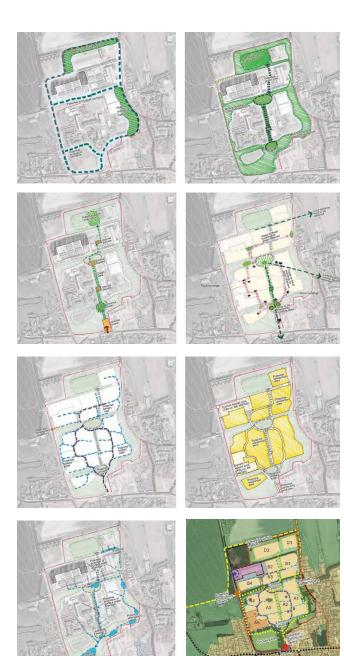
Thumbnail plans extracted from the submitted DAS (2020)
